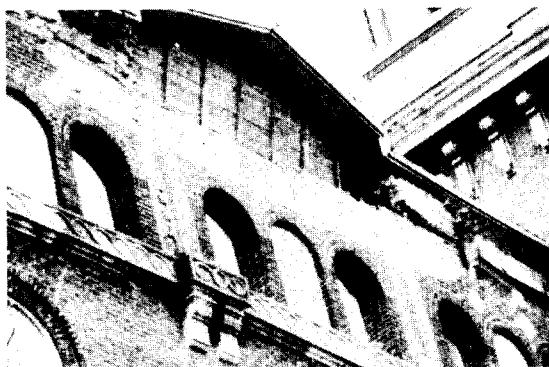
Failure due to combined out-of-plane failure of parapet and inadequacy of collar joint in multiwythes URM wall (Quebec City, Saguenay Earthquake)
